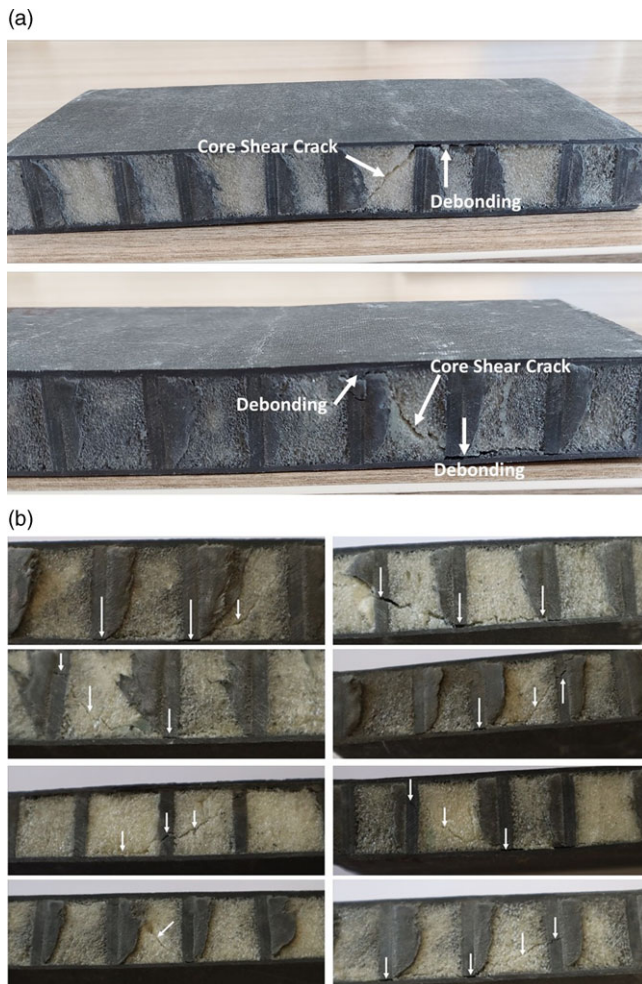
Failures in polyurethane foam-filled specimens (a) core shear cracks and core-face debonding failure, (b) propagation of core shear cracks in all specimens.
